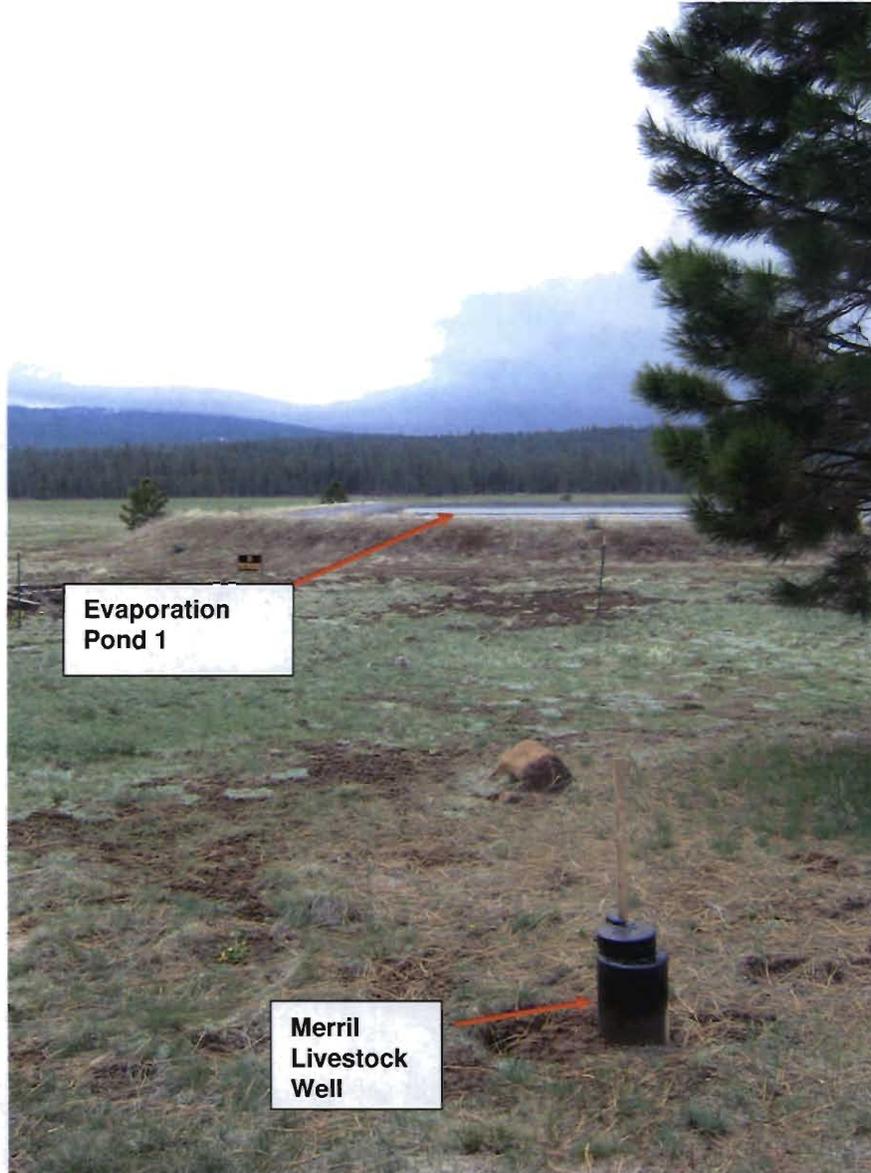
Eagle Lake Wastewater Facility – Merrill Livestock well looking south towards Evaporation Pond 1. (Taylor Zentner, 05-01-09, Sony Cybershot camera)
